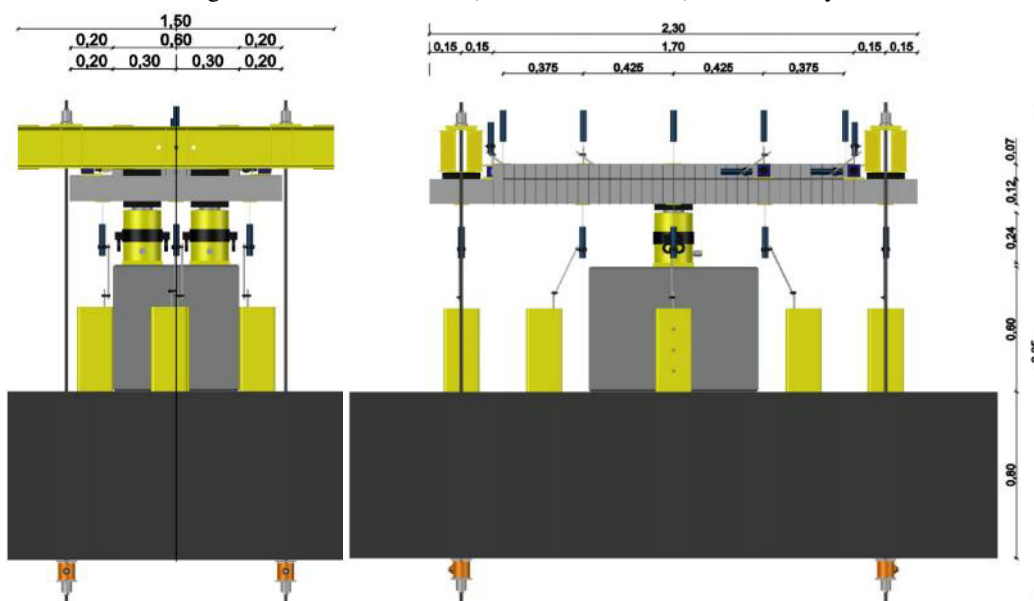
Dimensions (front and side view) of  $R_L$  test layout.
